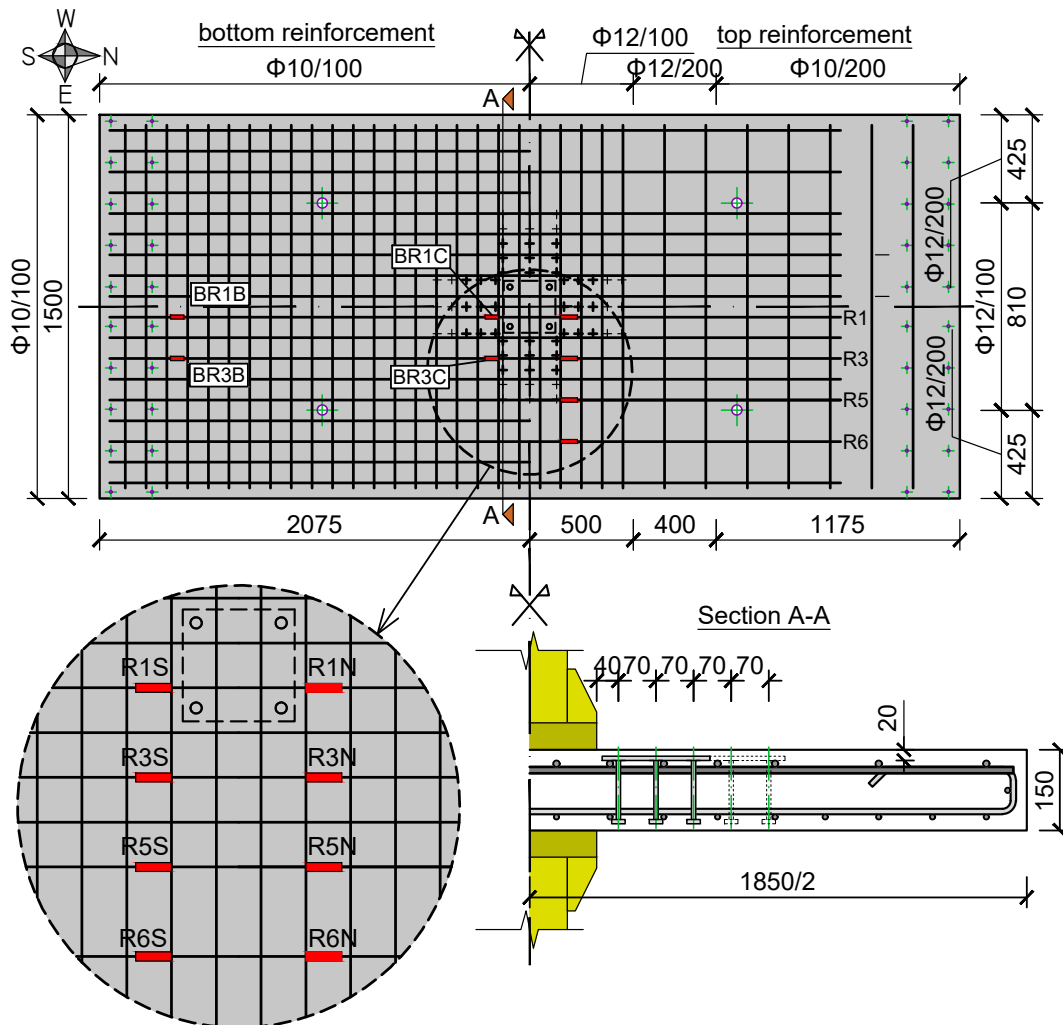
Reinforcement details and instrumentation (dimensions in millimetres)
